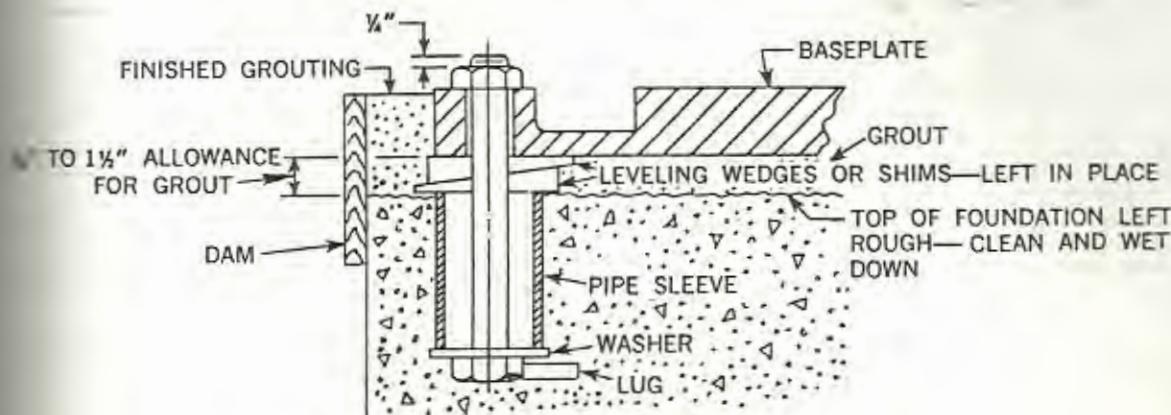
TYPICAL FOUNDATION BOLT DESIGN
